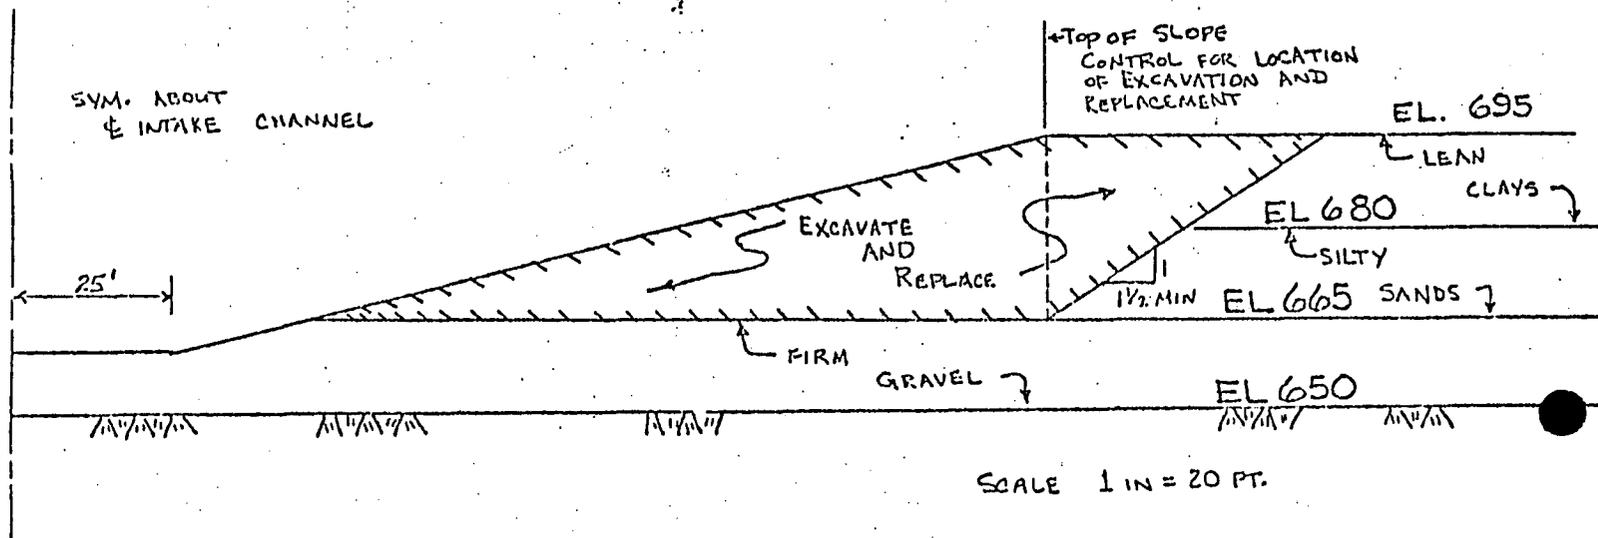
Intake Channel - Lateral Excavation and Replacement
